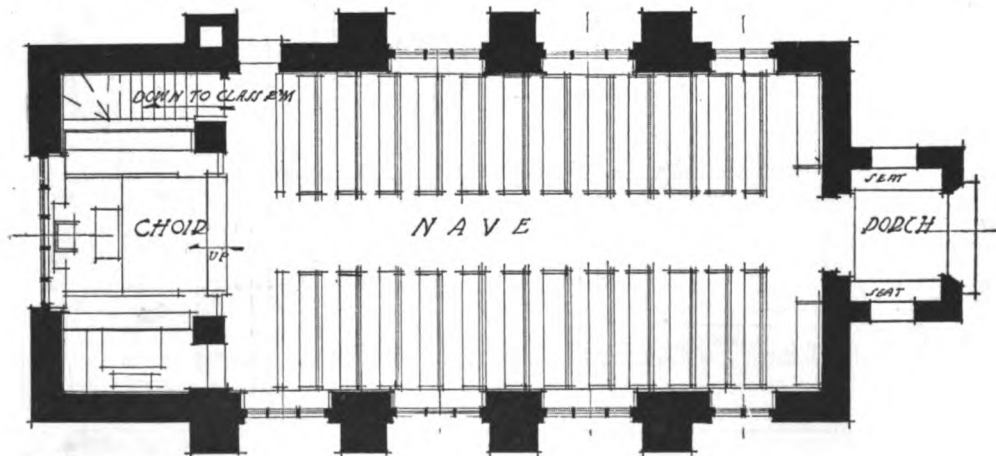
CHURCH AT SOUTH INGOMISH, CAPE BRETON.
